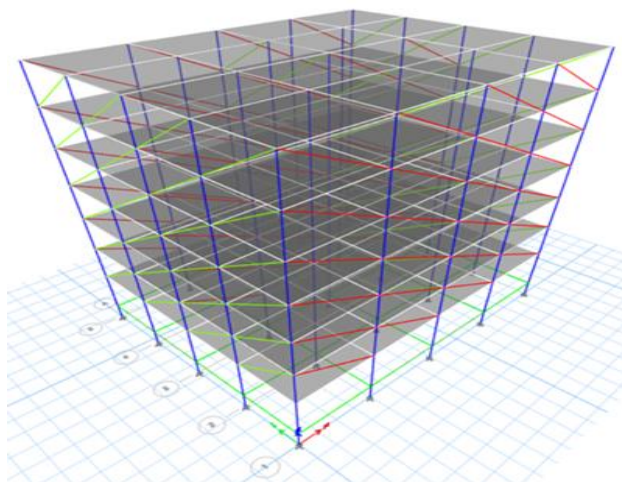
Infill with 230mm Wall Struts (Model 2 & 5)
